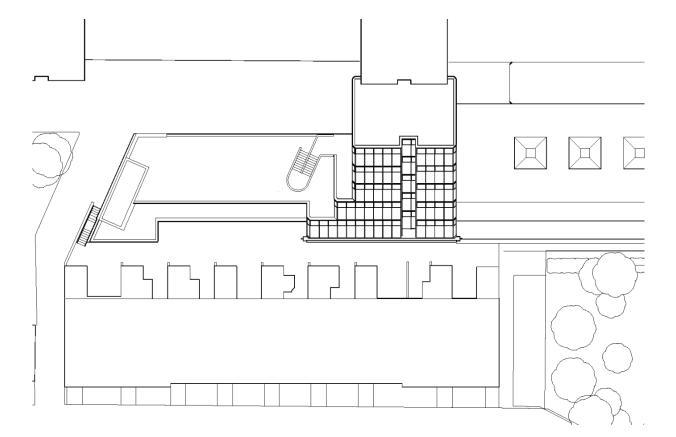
Roof plan as approved with sloped glazing to spur and no cantilever over the service road
